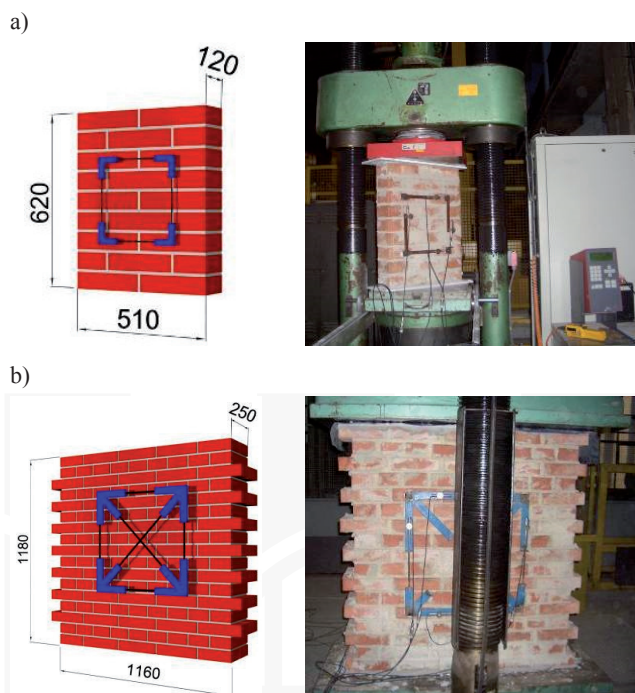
The shape, dimensions and view of both types of specimens ready for testing:
